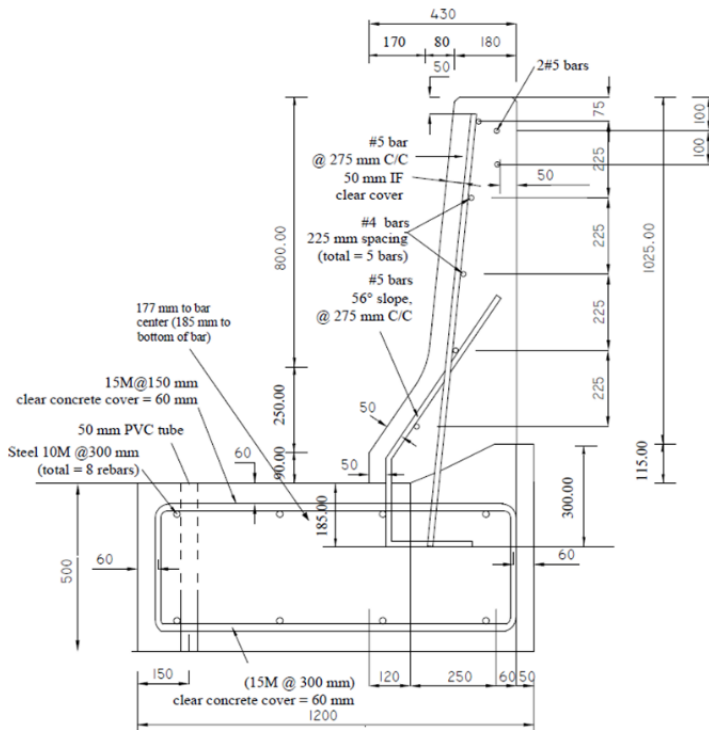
Specimen S1-FRC10 dimensions and reinforcement details (units in mm)
